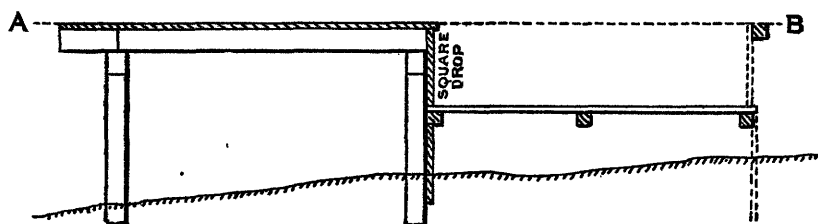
Vertical section of drop on North Poudre Canal. A B, line of canal.
